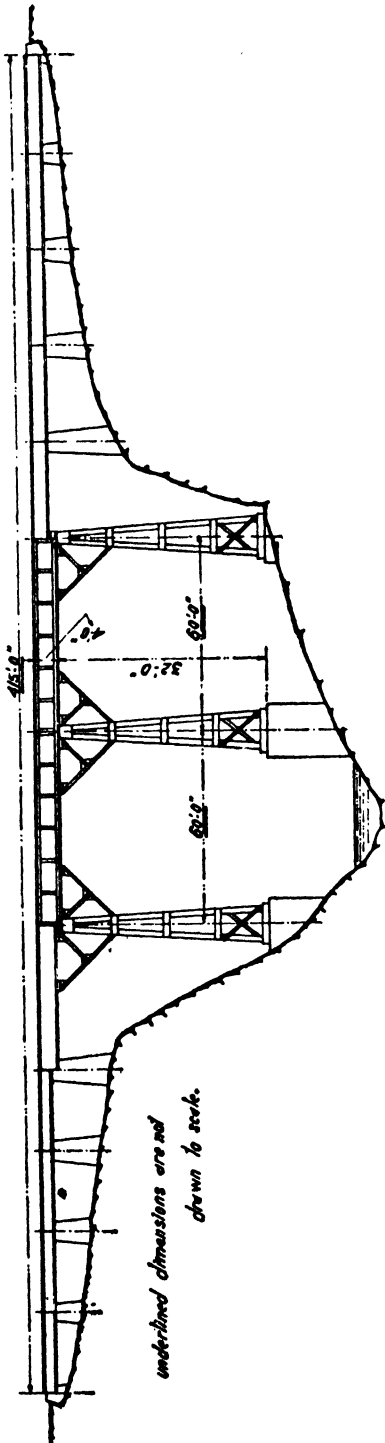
Narrow Gauge Plantation Railway Bridge.
